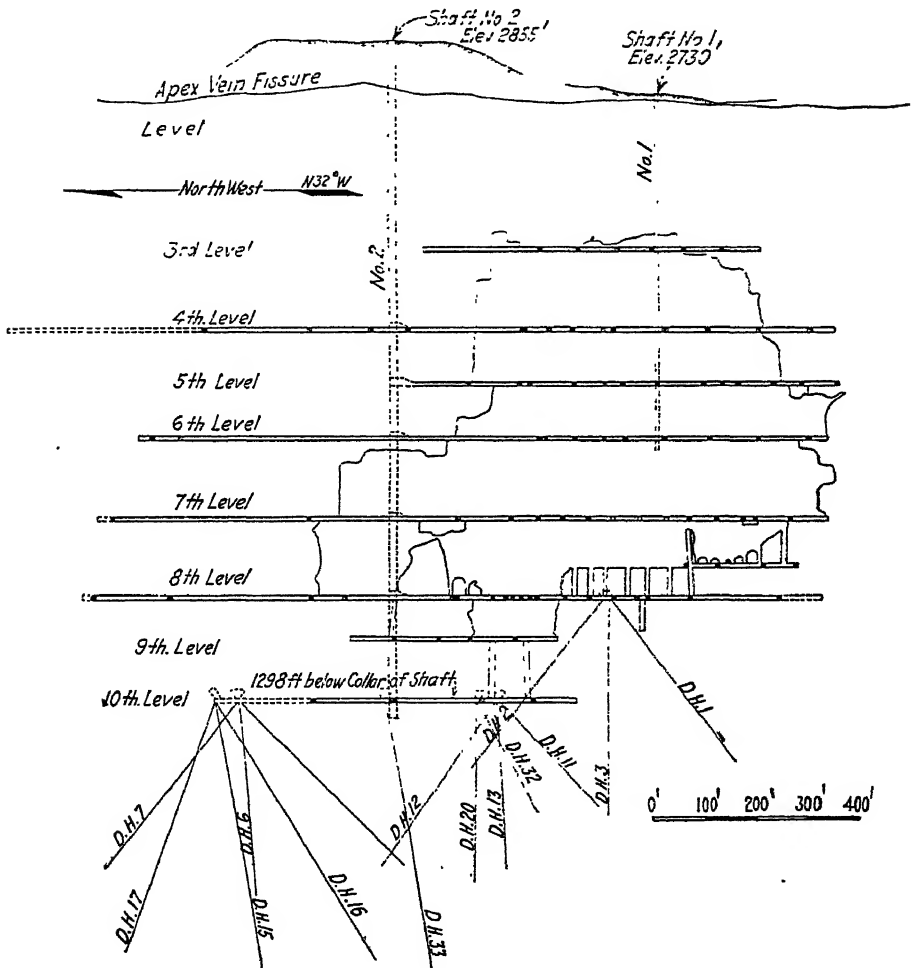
LONGITUDINAL SECTION THROUGH NO. 2 SHAFT STOPE, TOM REED EXTENSION.
